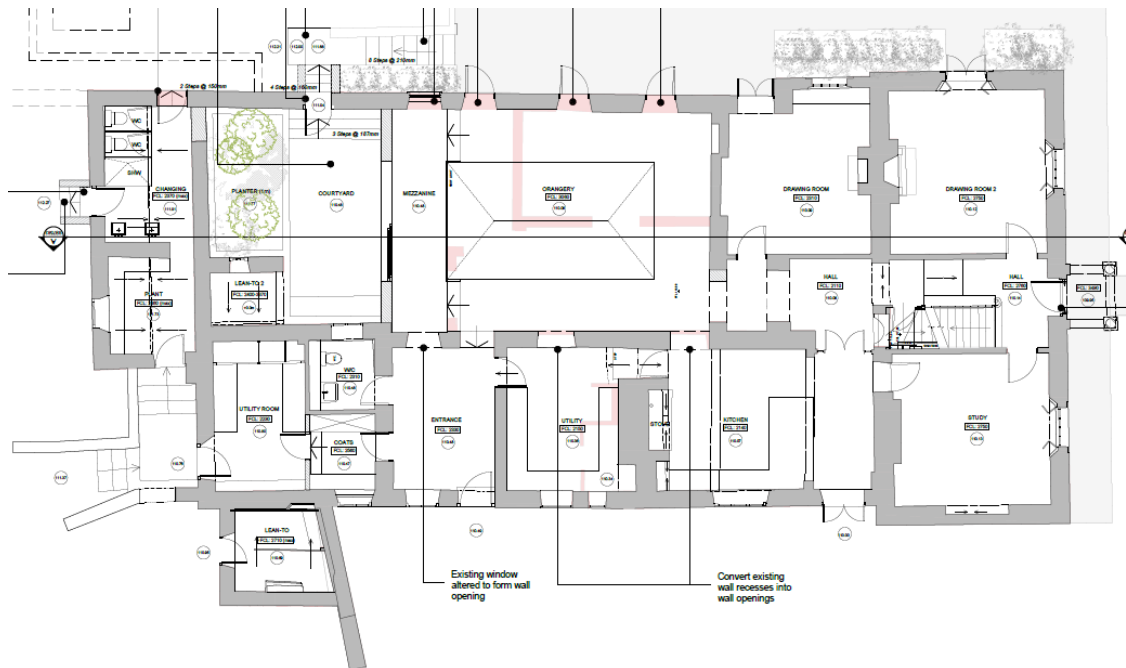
Proposed Ground Floor (Concept Eight Architects, 2023)
